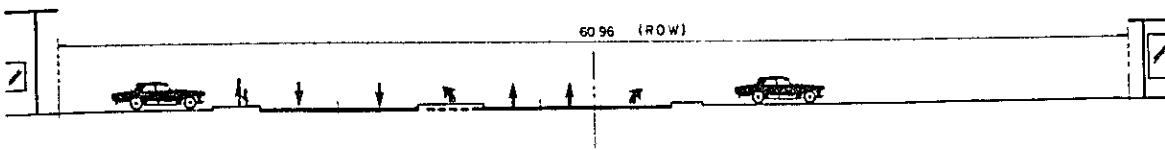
EXISTING CROSS SECTION OF VIA BOLIVAR
